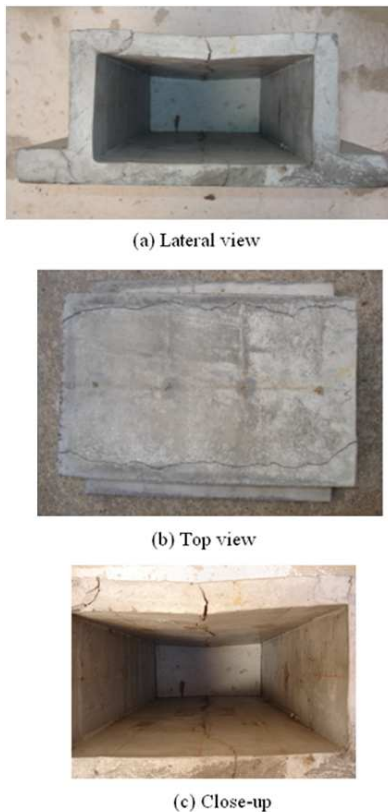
Crack patterns of the RC tunnel specimen after loading in experiment
